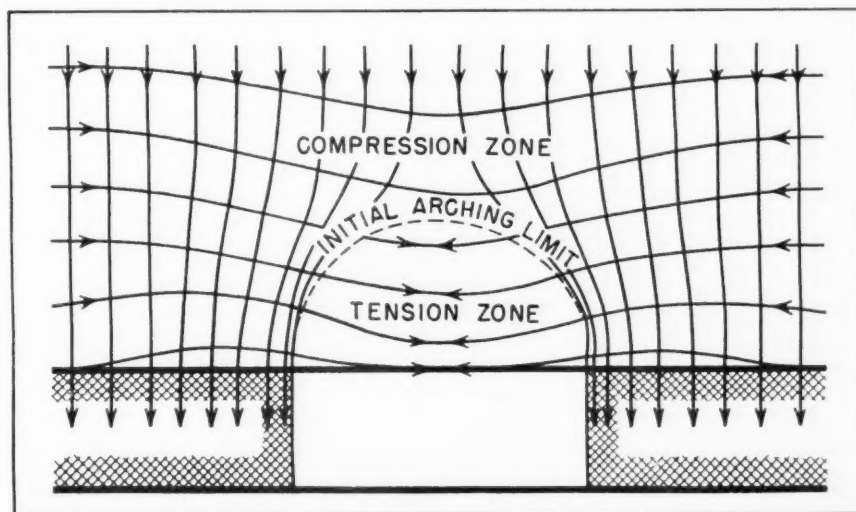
APPROXIMATE DISTRIBUTION OF ROOF STRESSES above an untimbered opening.
